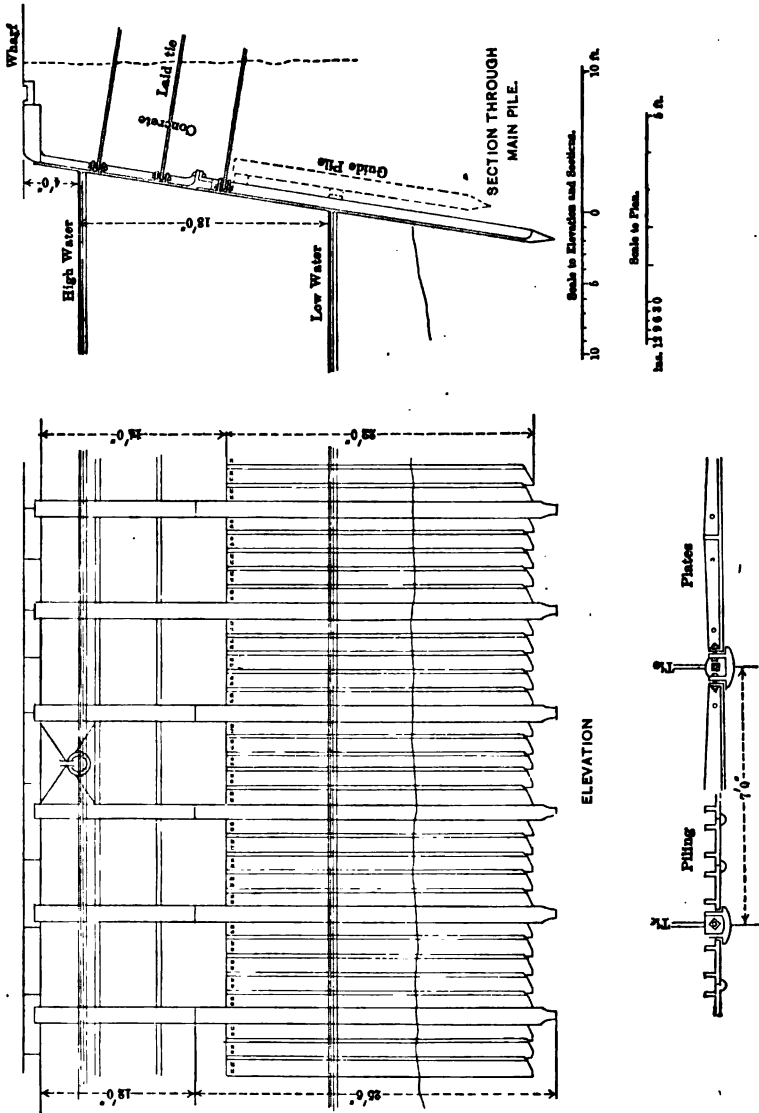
BRUNSWICK WHARF, IRON SHEET-PILING.
